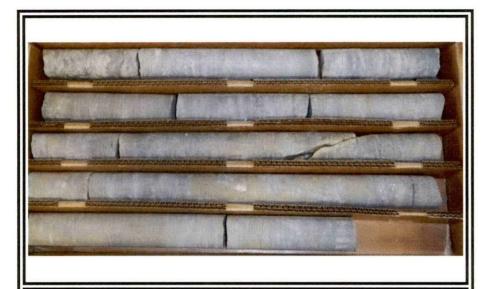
Rock core sample at B-1 from about 26.5 to 36.5 feet below existing grade
